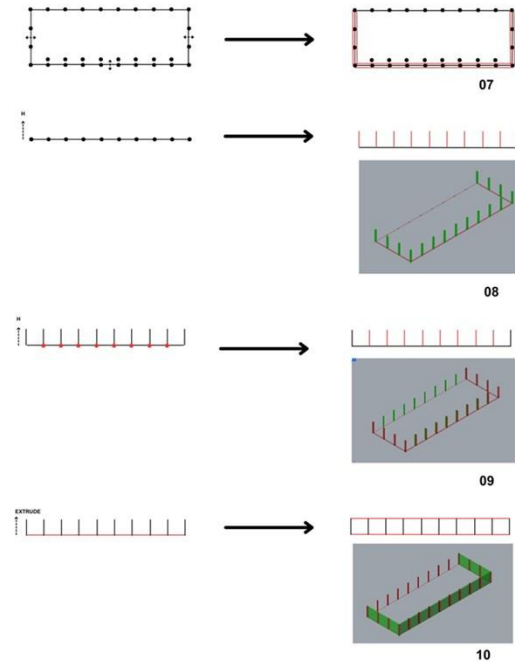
Sequence 7 to 10 Explaining Wall Formation Process, and Height of Brick and Steel Columns
